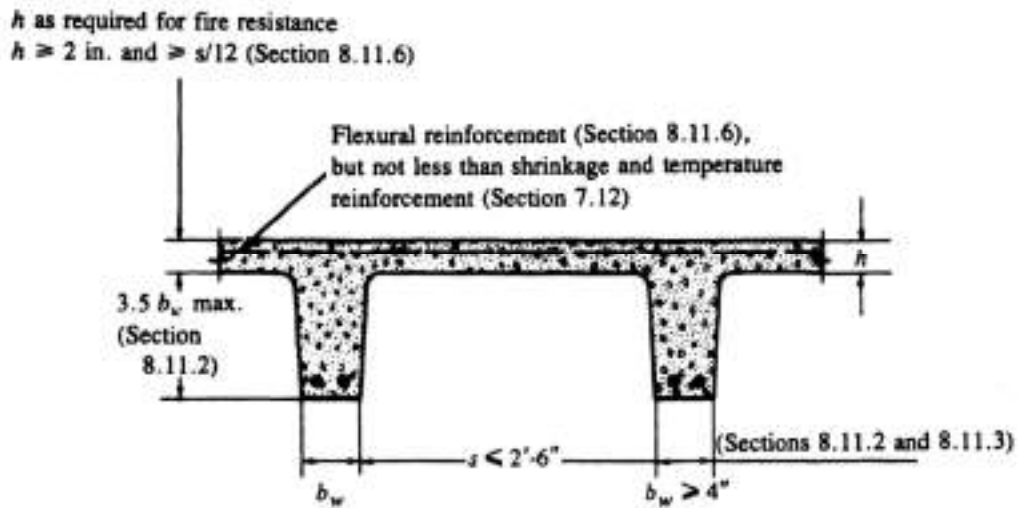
Limiting dimensions of concrete waffle slab, joist construction, and removable filler forms.
